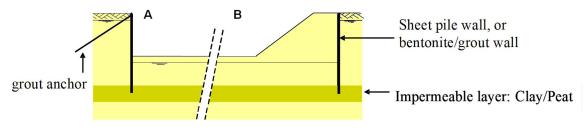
A natural sealing layer (Cofferdam - left; Construction pit - right)
